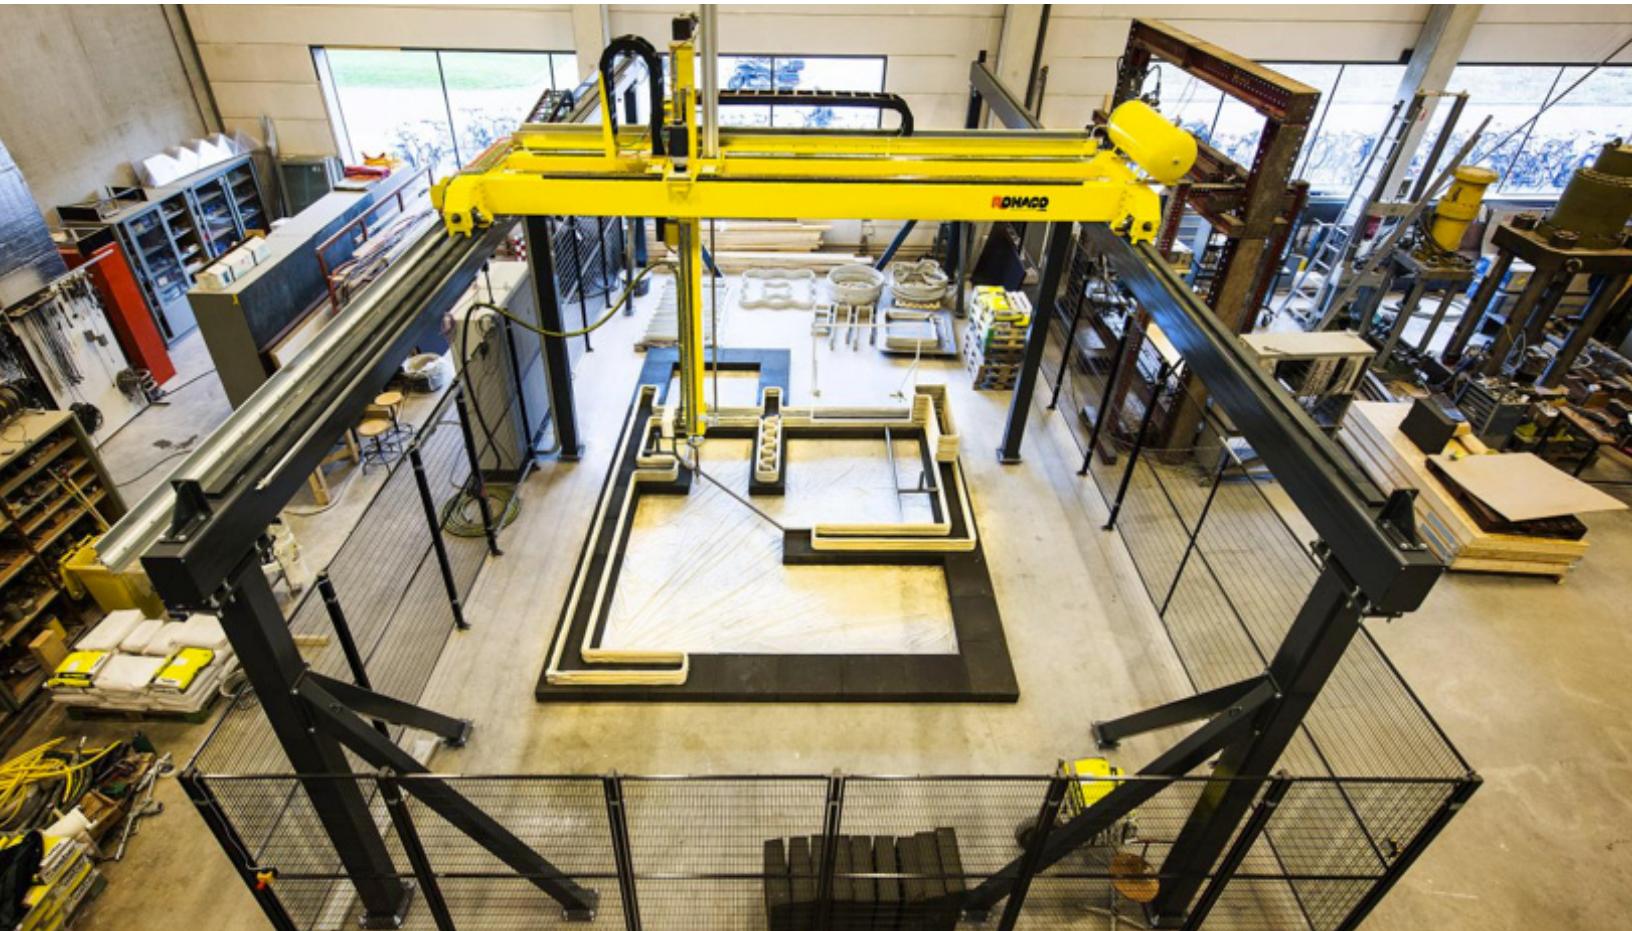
DUS Architects is an Amsterdam-based company that developed a large 3-D printer of 6m tall (KamerMaker) to fabricate a canal house. The 3D printer can fabricate components with dimensions of up to  $2.2 \times 2.2 \times 3.5$ m and uses polypropylene as the printing material. The components of the canal house were fabricated in the factory and installed on site later. The project is expected to be completed in 2017. The picture shows the 3D printer and the model of canal house.
